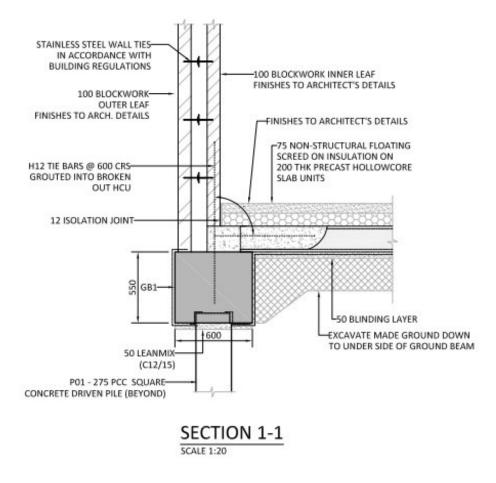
Typical Section through Pile Foundation for new Housing Unit B
